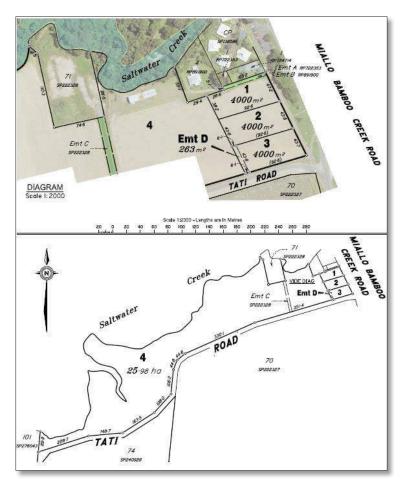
Extract of Proposal Plan 32204-PP01 Rev B (source – Veris)
